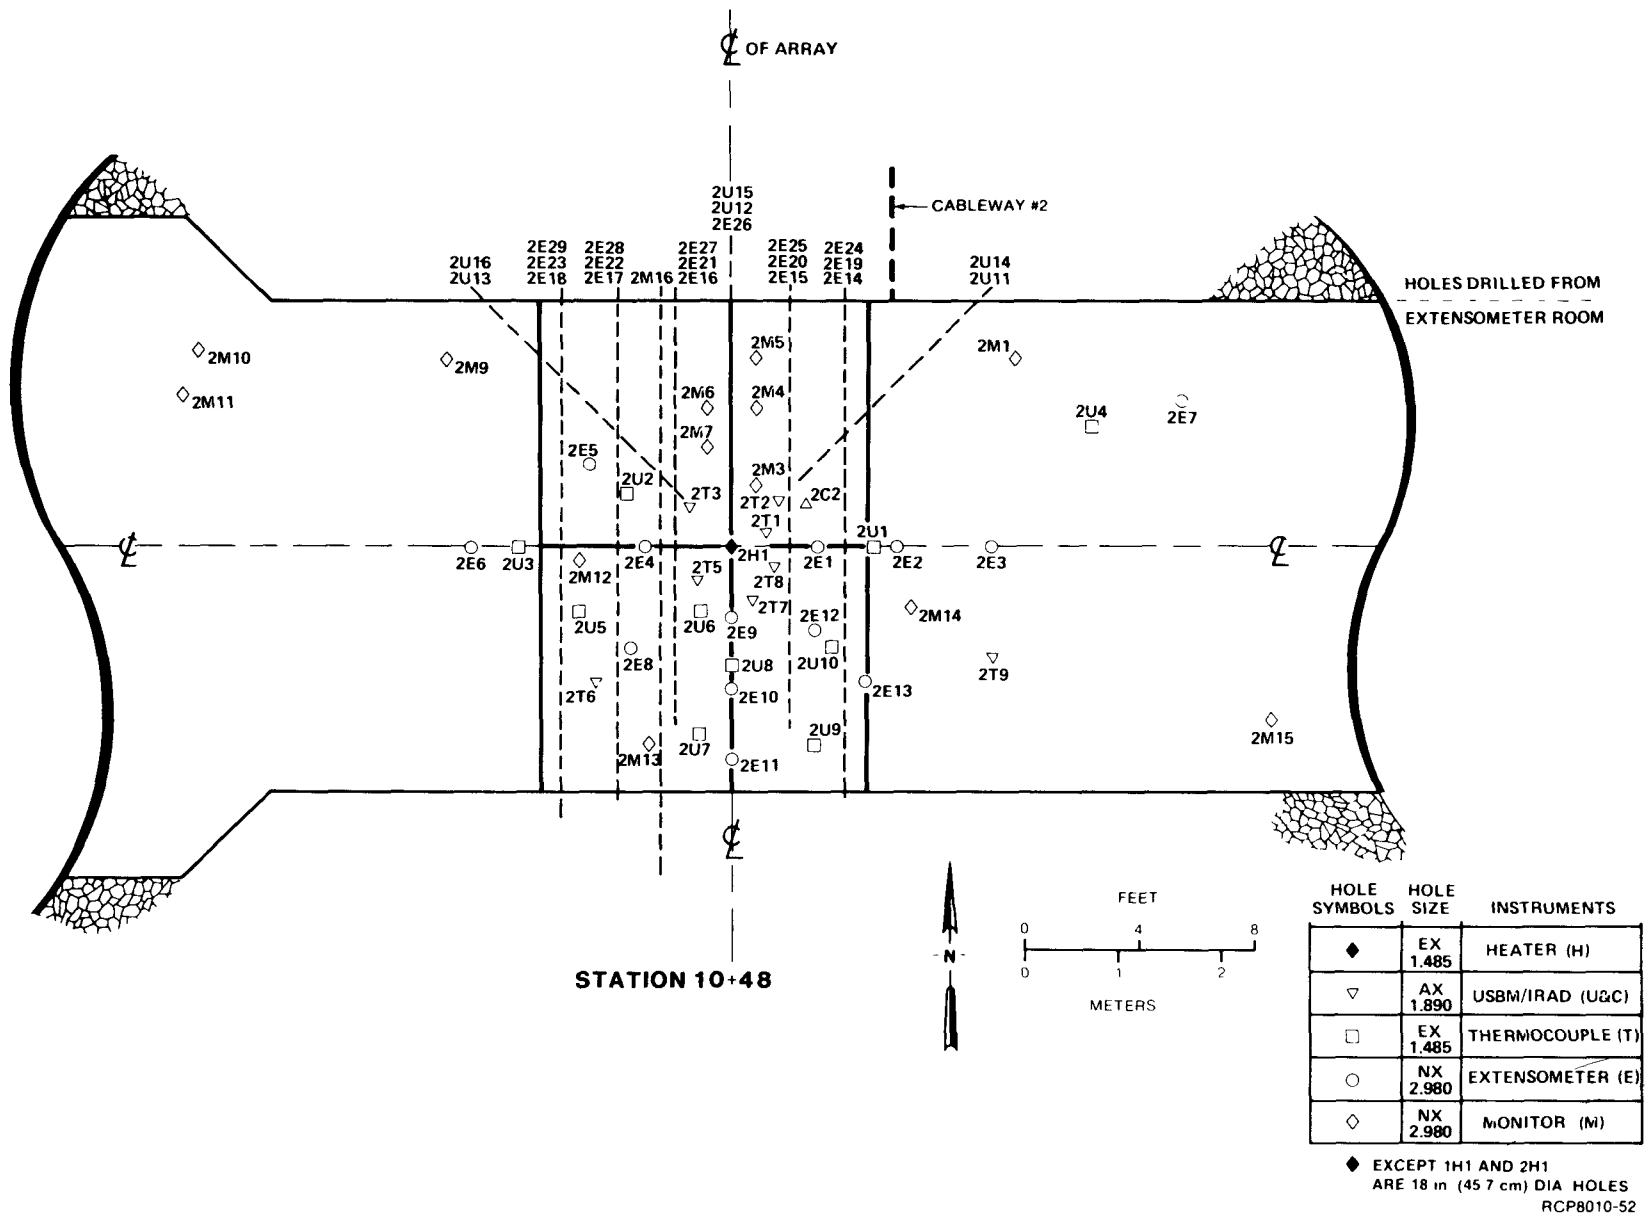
Plan View of Boreholes Drilled for Full-Scale Heater Test #2.
